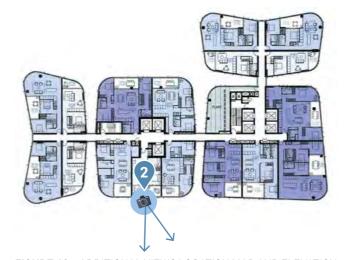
ADDITIONAL VIEWS LOCATION MAP AND ELEVATION
